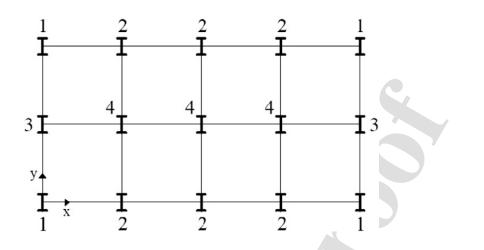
Columns grouping of 135-member 3-story steel frame in plan level, [41].
